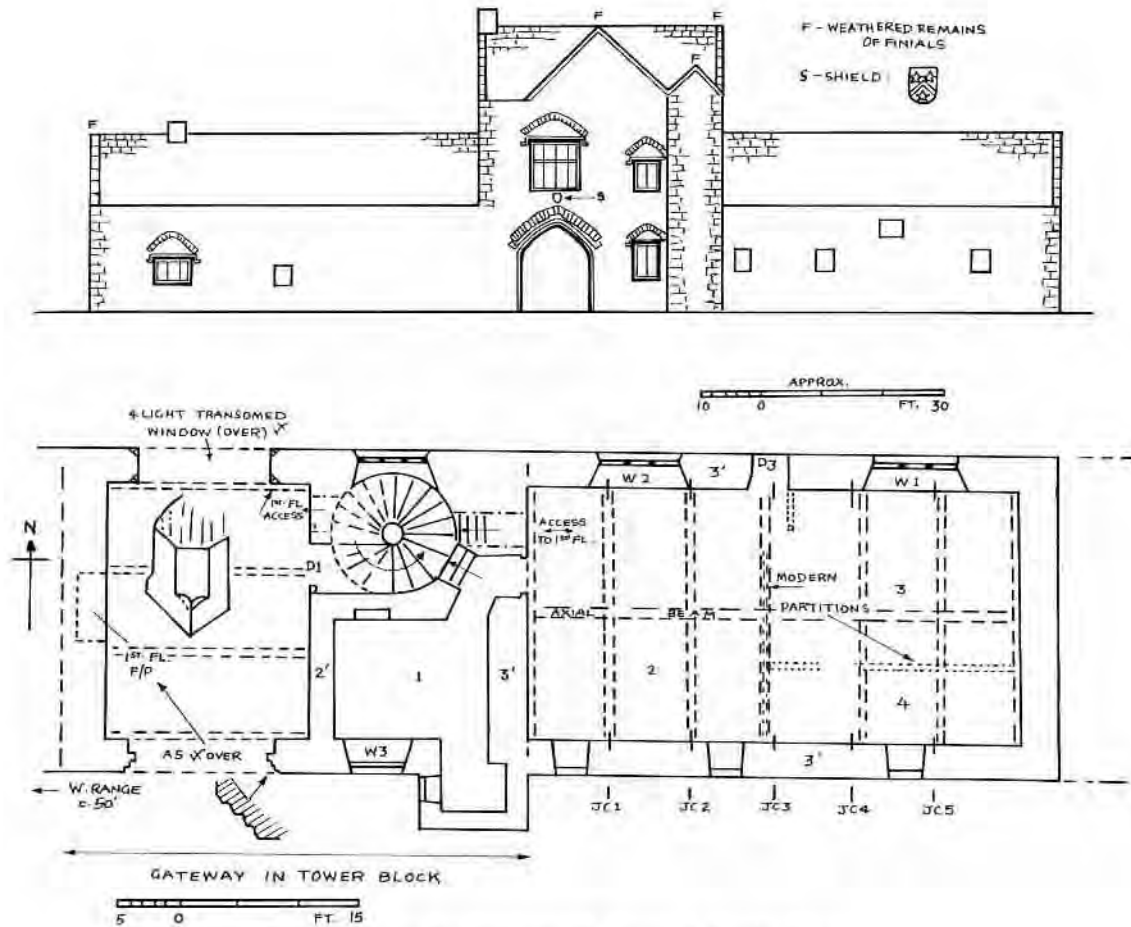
(a) Manor Gatehouse (south elevation), Combe Florey
